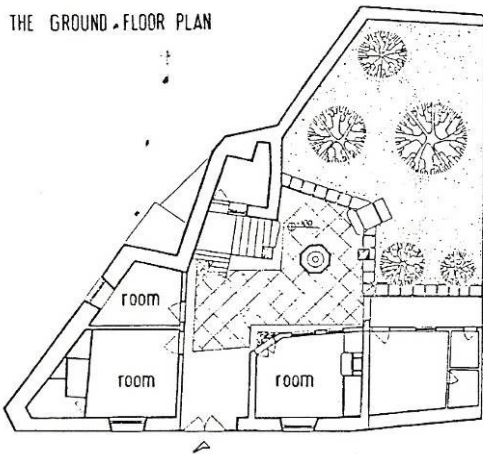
Ground floor plan of a Turkish house in Namazgah, İzmir.
